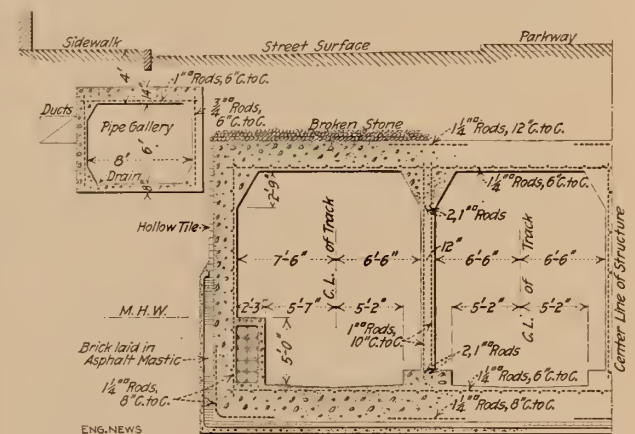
HALF SECTION OF B. R. T. SUBWAY ON FOURTH AVE., BROOKLYN, BUILT IN REINFORCED CONCRETE WITH PIPE GALLERY UNDER SIDEWALK
